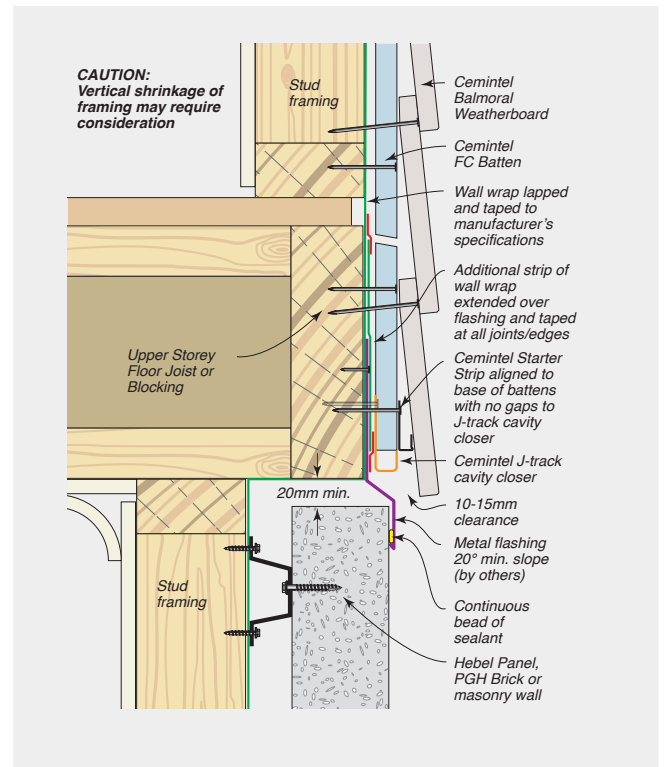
Typical Second Storey Junction over Hebel Panels, Brick Veneer or Masonry Wall – Cantilevered Framing
